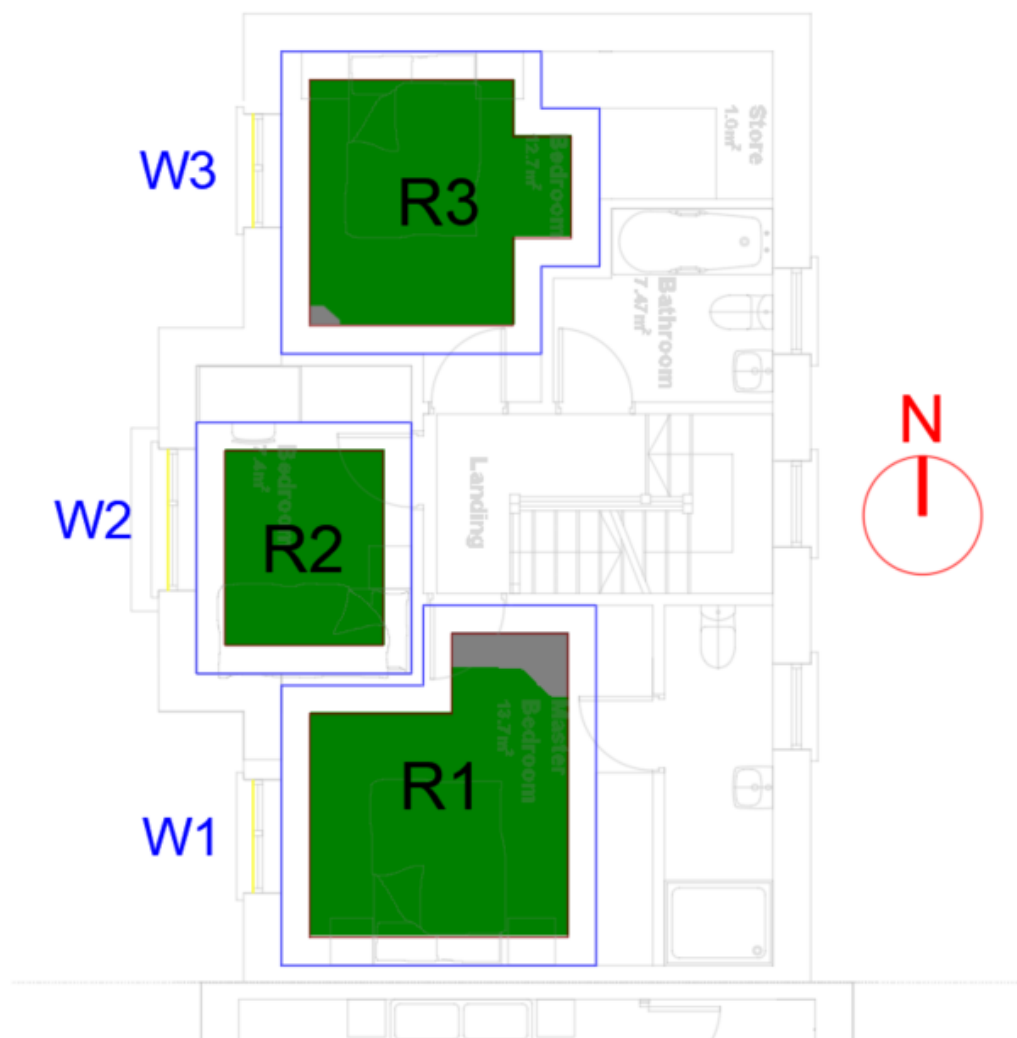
Proposed First Floor sDA Contours of House F-02 2-037
